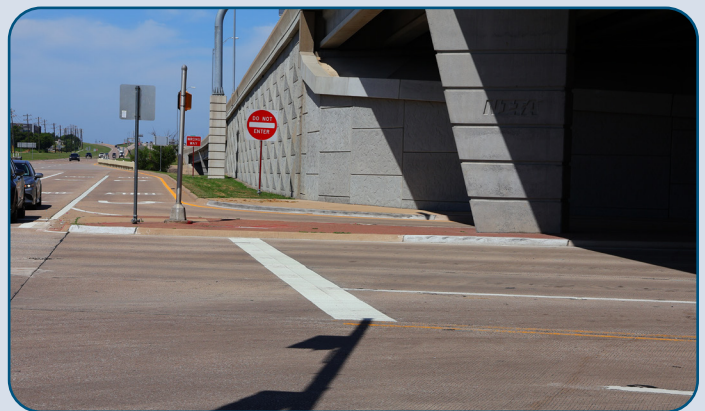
SRT at Independence Pkwy. – Concrete Pavement and Curb Repairs.
